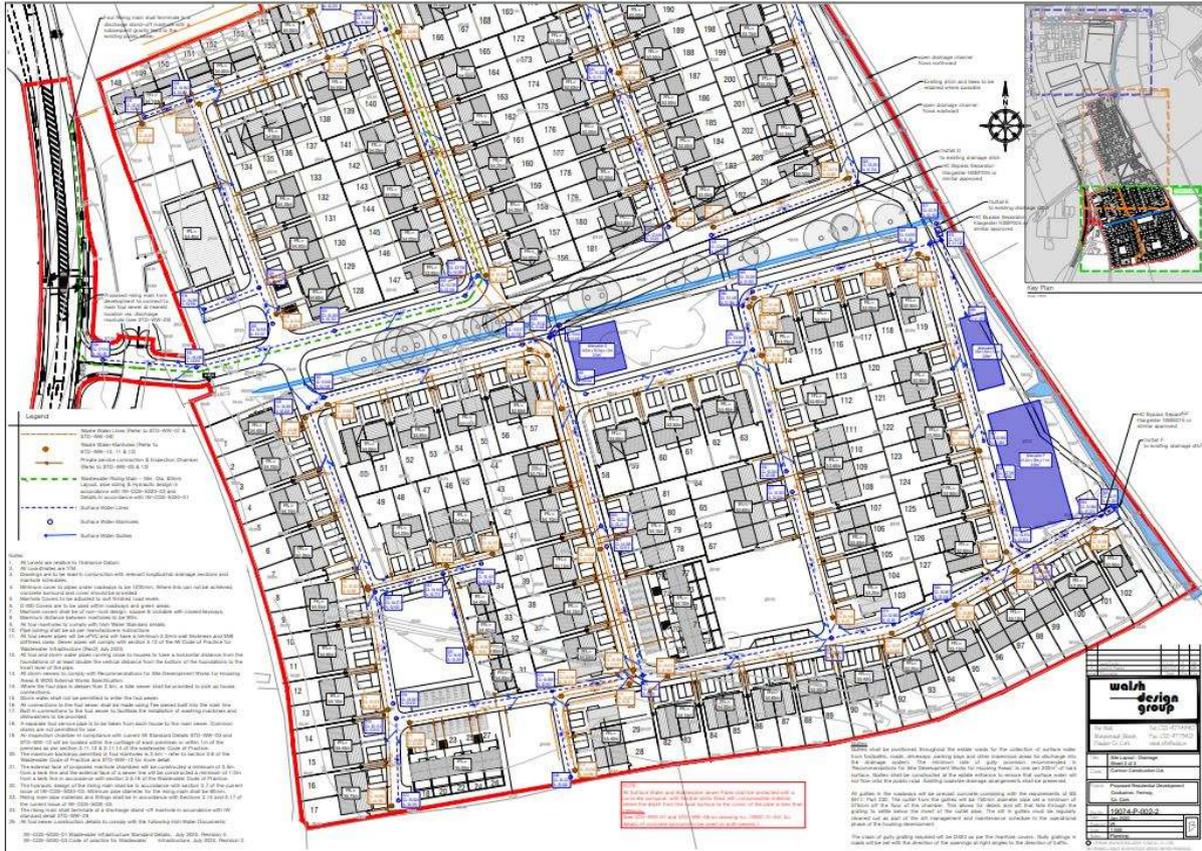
WDG Drawing No. 19074-P-002-2 - Southern Half of the Development Site Drainage Layout (Not to scale)
